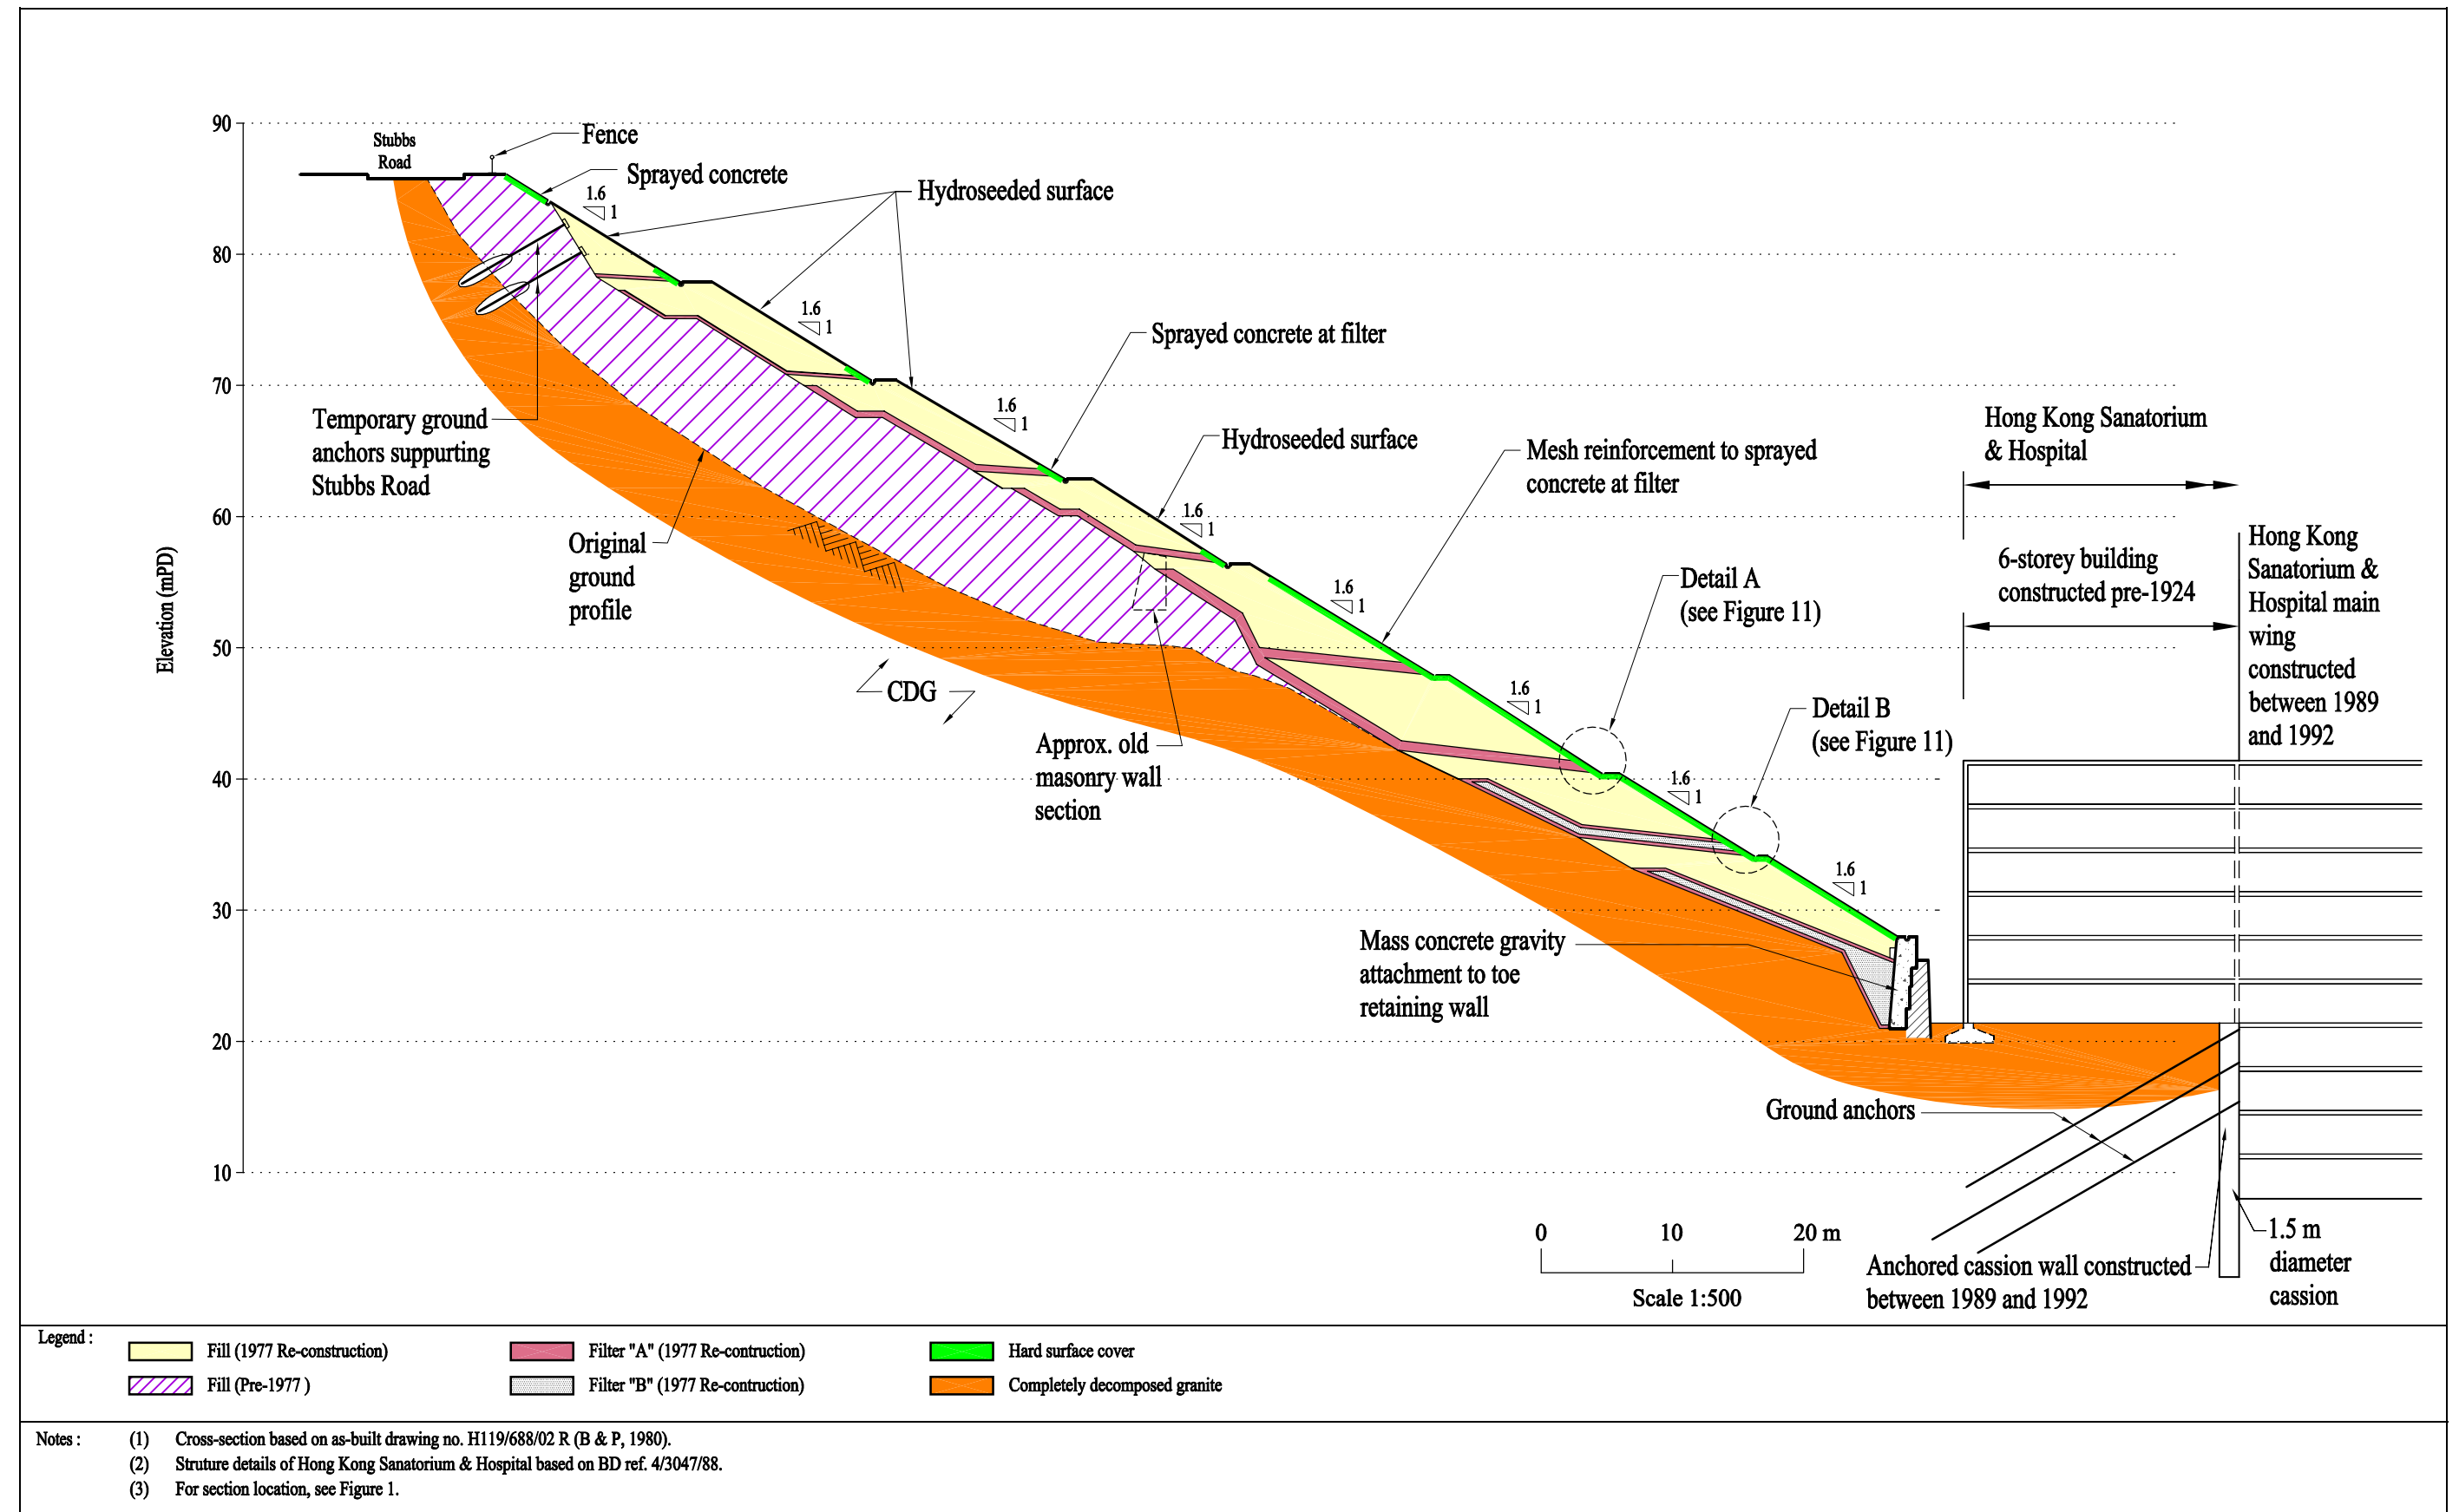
Cross-section A - A Through the Slope Following Upgrading Works
